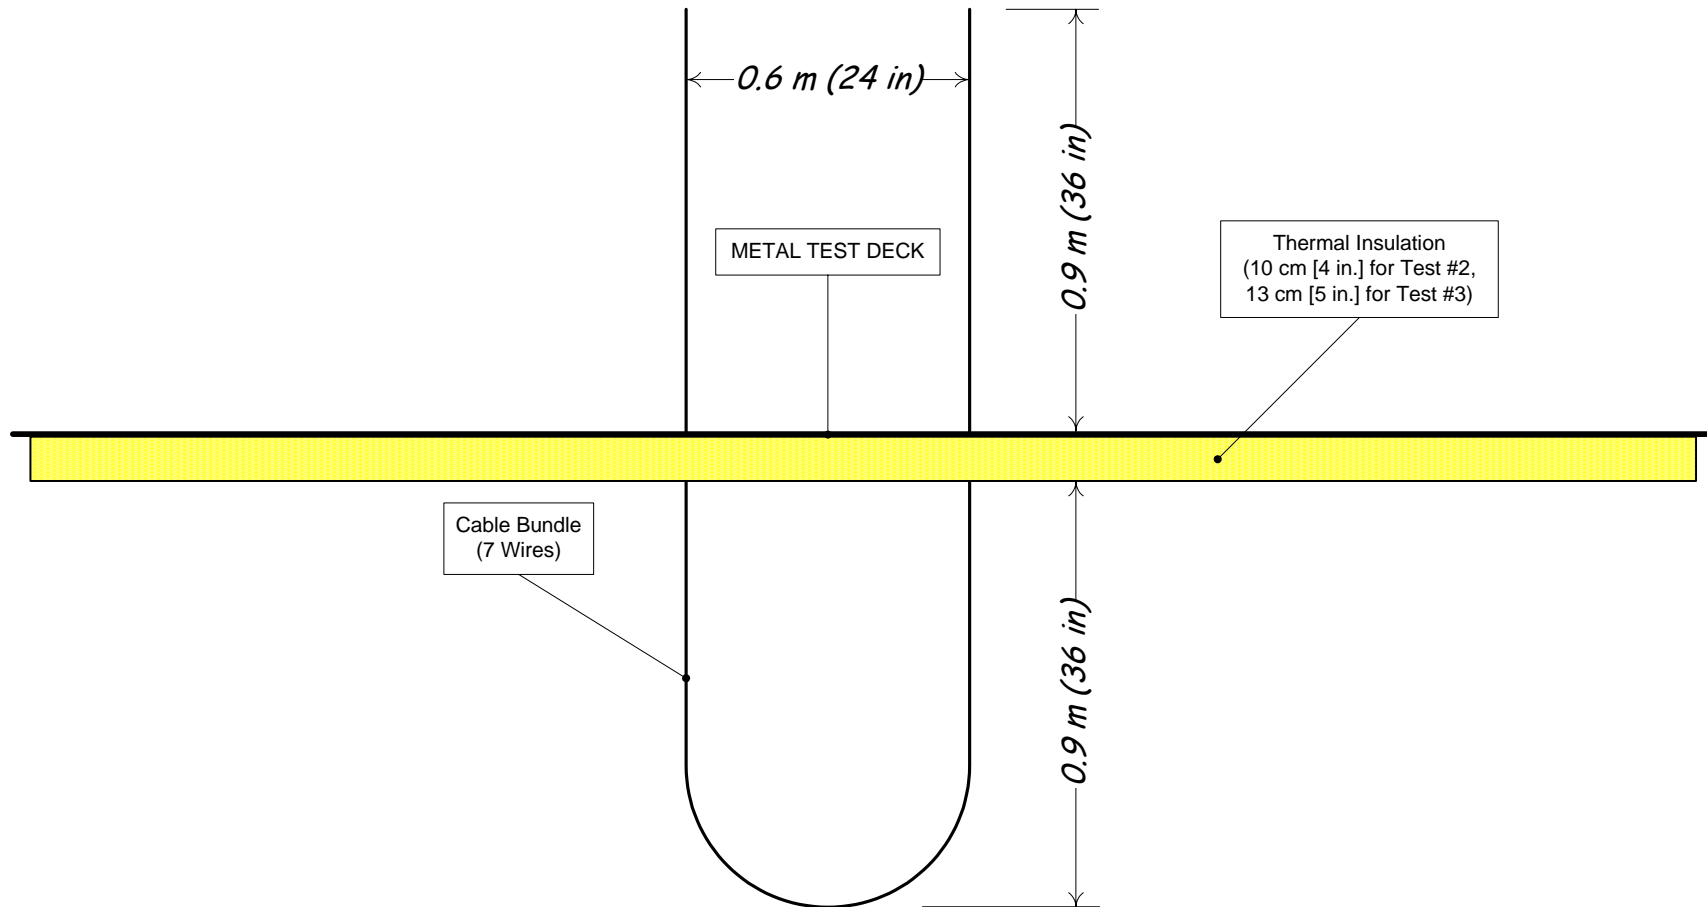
Unsupported cable-drop test specimens (side view with dimensions).
